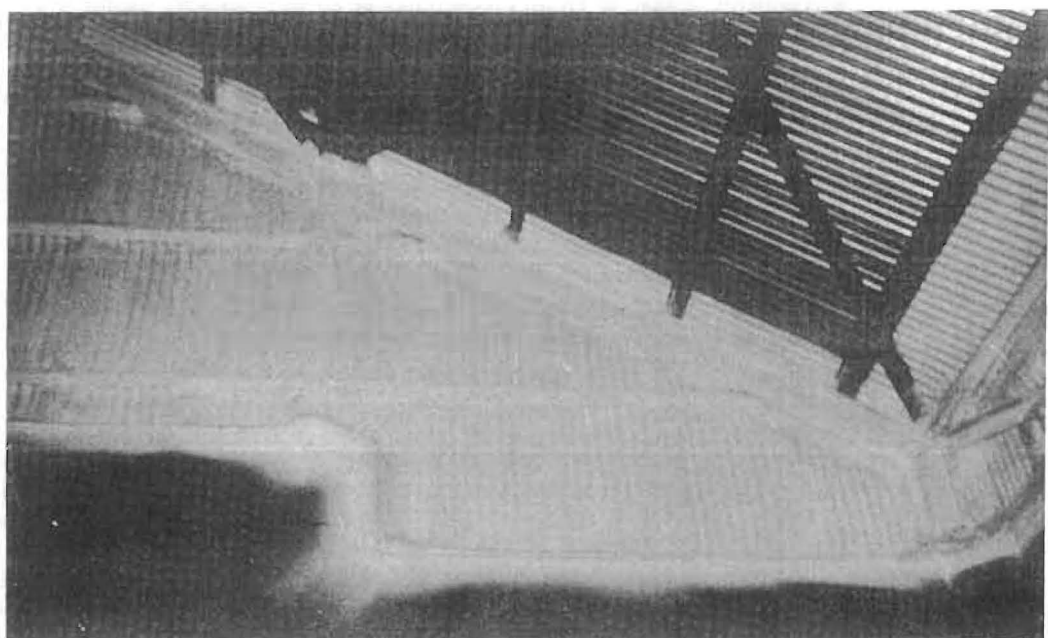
View of a gable end wall at the Meckering horizontal Silo after foaming of all joints and spray sealing of the finishing coat.
